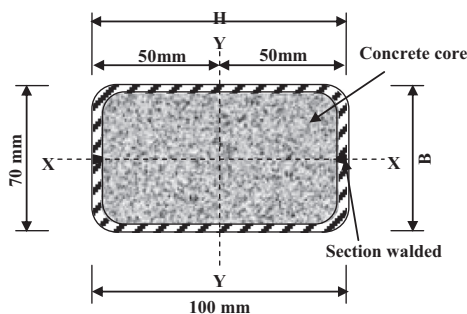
Thin cold formed and welded steel cross section details.
